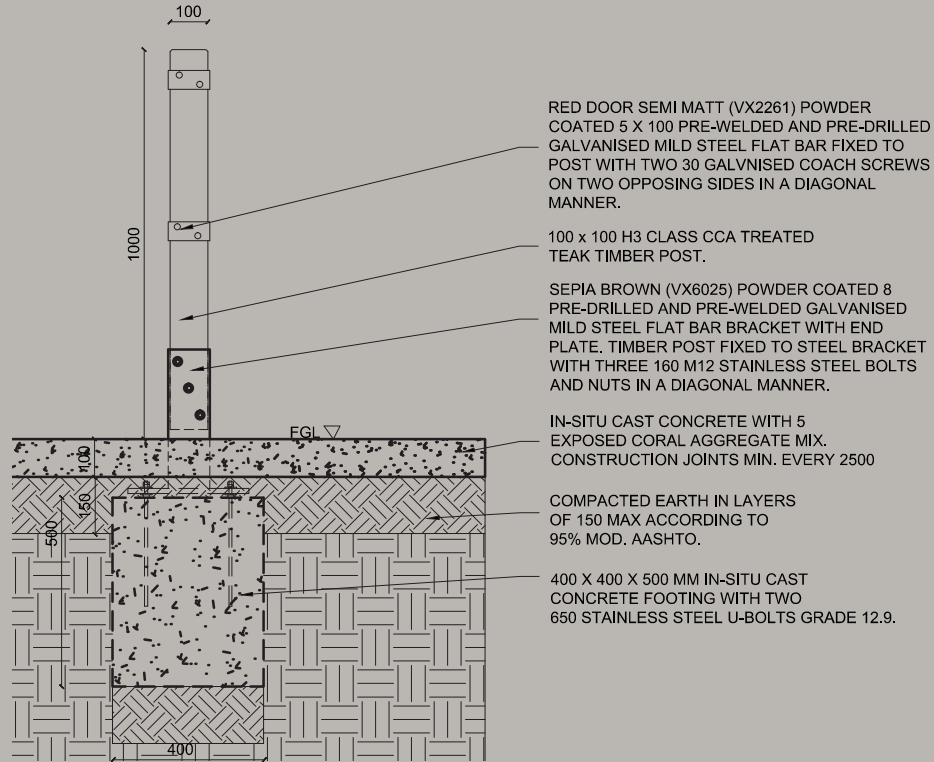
Detail Section (1:20) of Bollard (Author, 2014).
